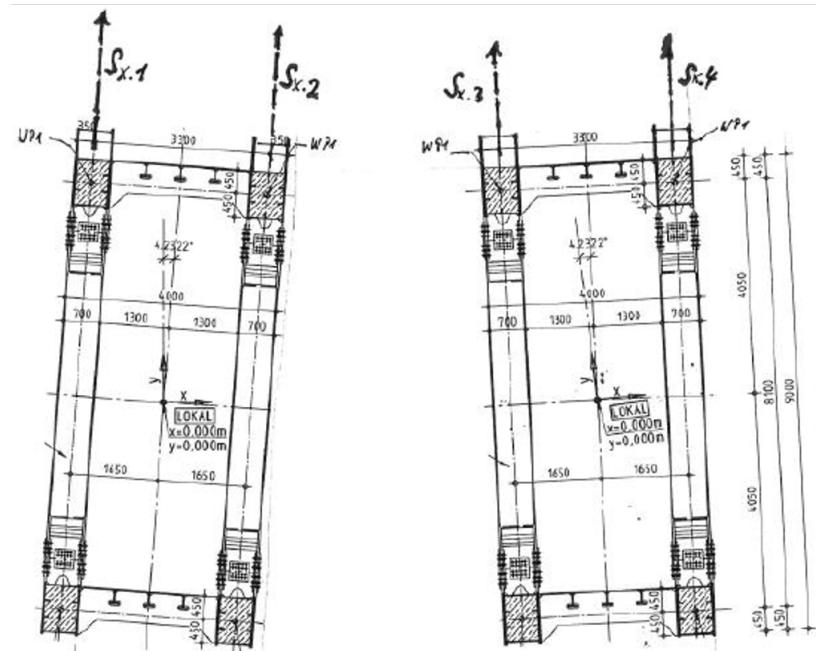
Photo showing cross section of Arch and sequence of stressing cables
